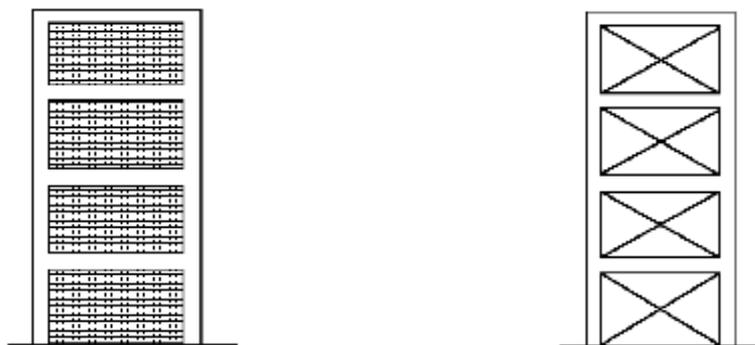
Re-evaluation of seismic capacity of 4-storey RC frame with infill wall and steel bracing
